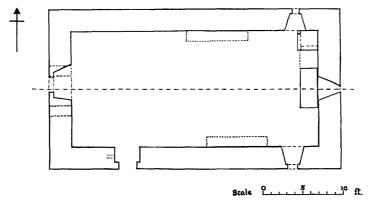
ST. MICHAEL'S CHAPEL, MALEW. Plan
